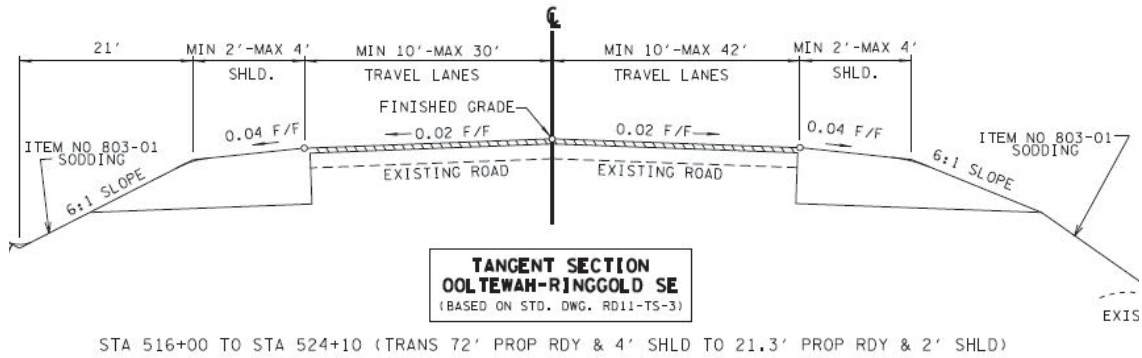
Typical Section of SR-321 south of the intersection with SR-320, widened section near the intersection (05/12/2020 ROW Field Review Plans, Sheet 2B3) (looking from north to south)
